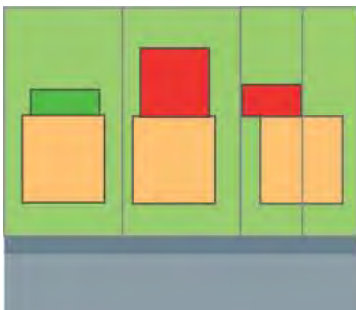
Left: Example of a well-designed rear extension situated at the back of the original property. More than 50% of the garden space is retained and access to the rear of the property is available down the side. Central: Poorly designed extension which is large and has more than 50% of the rear garden removed. Right: Access to the rear garden is prevented due to the siting of the rear extension.
